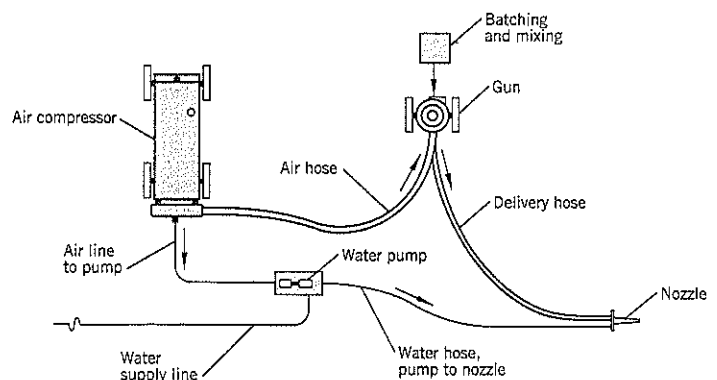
Typical plant layout for dry-mix shotcreting (Crom, 1966).
